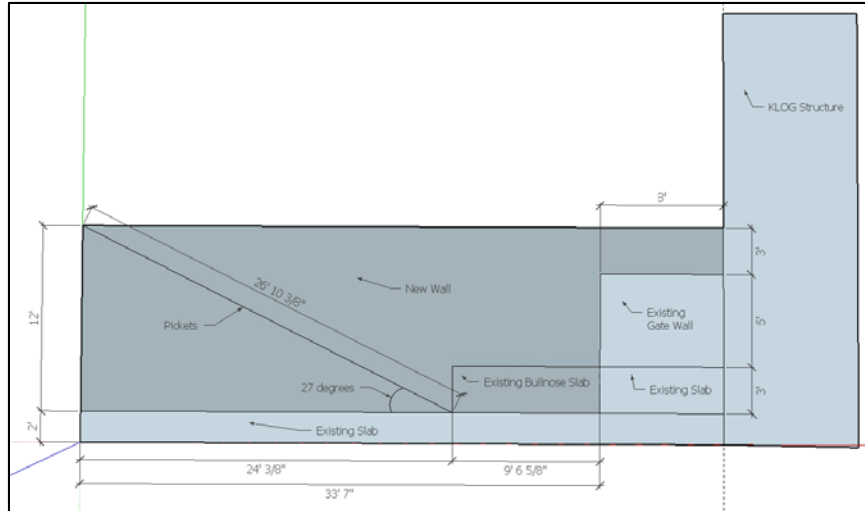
Side view and dimensions of features on the downstream side of KLOG with two raised side walls and a picket weir at the base of the existing concrete bullnose.
